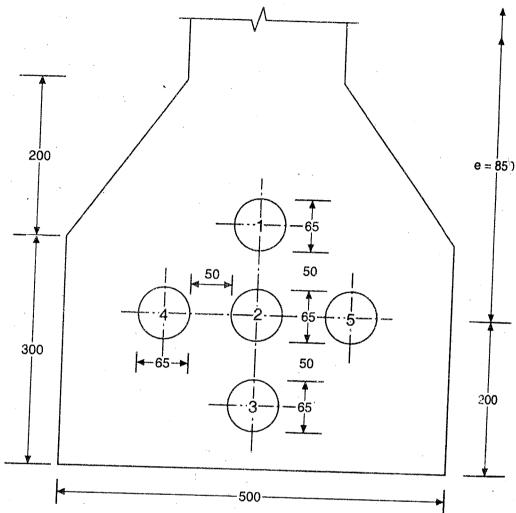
Arrangement of Cable at Centre of Span Section.
